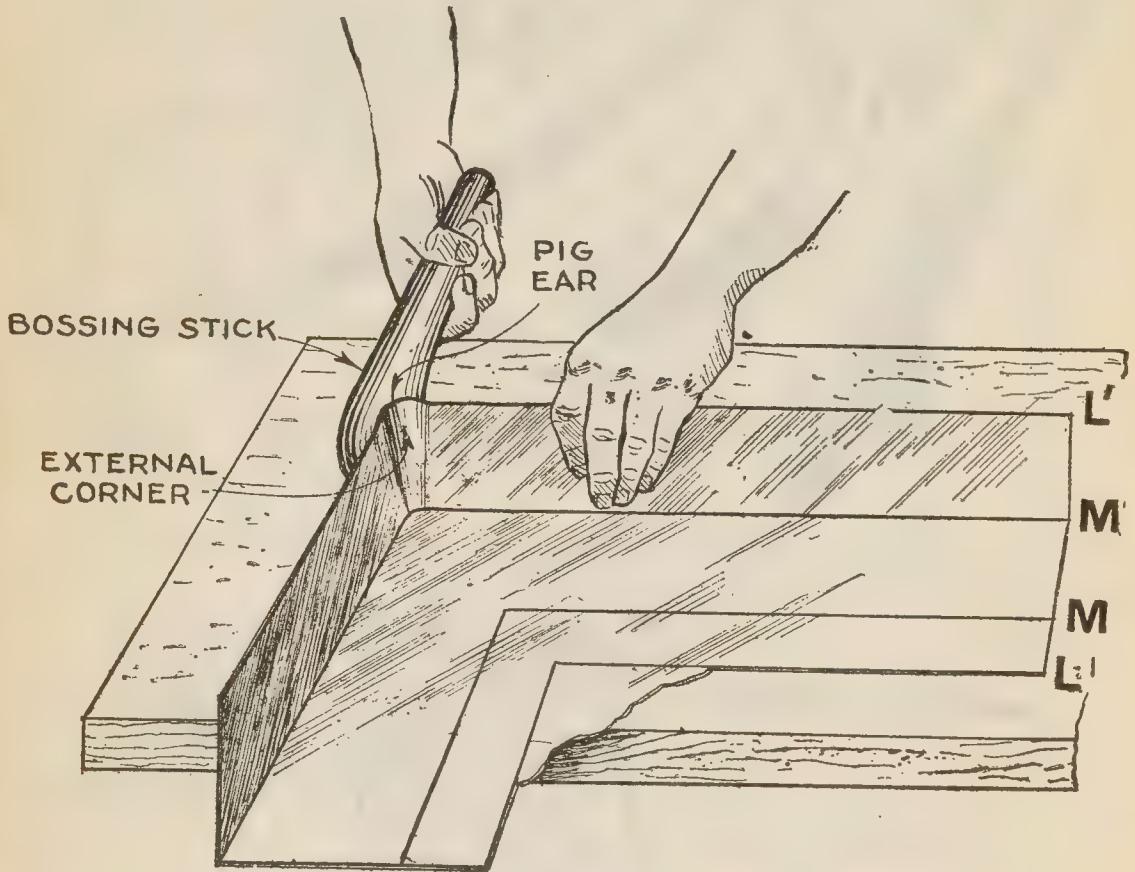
,545.—*Beating box gutter corner, 2. Bossing up external corner.
